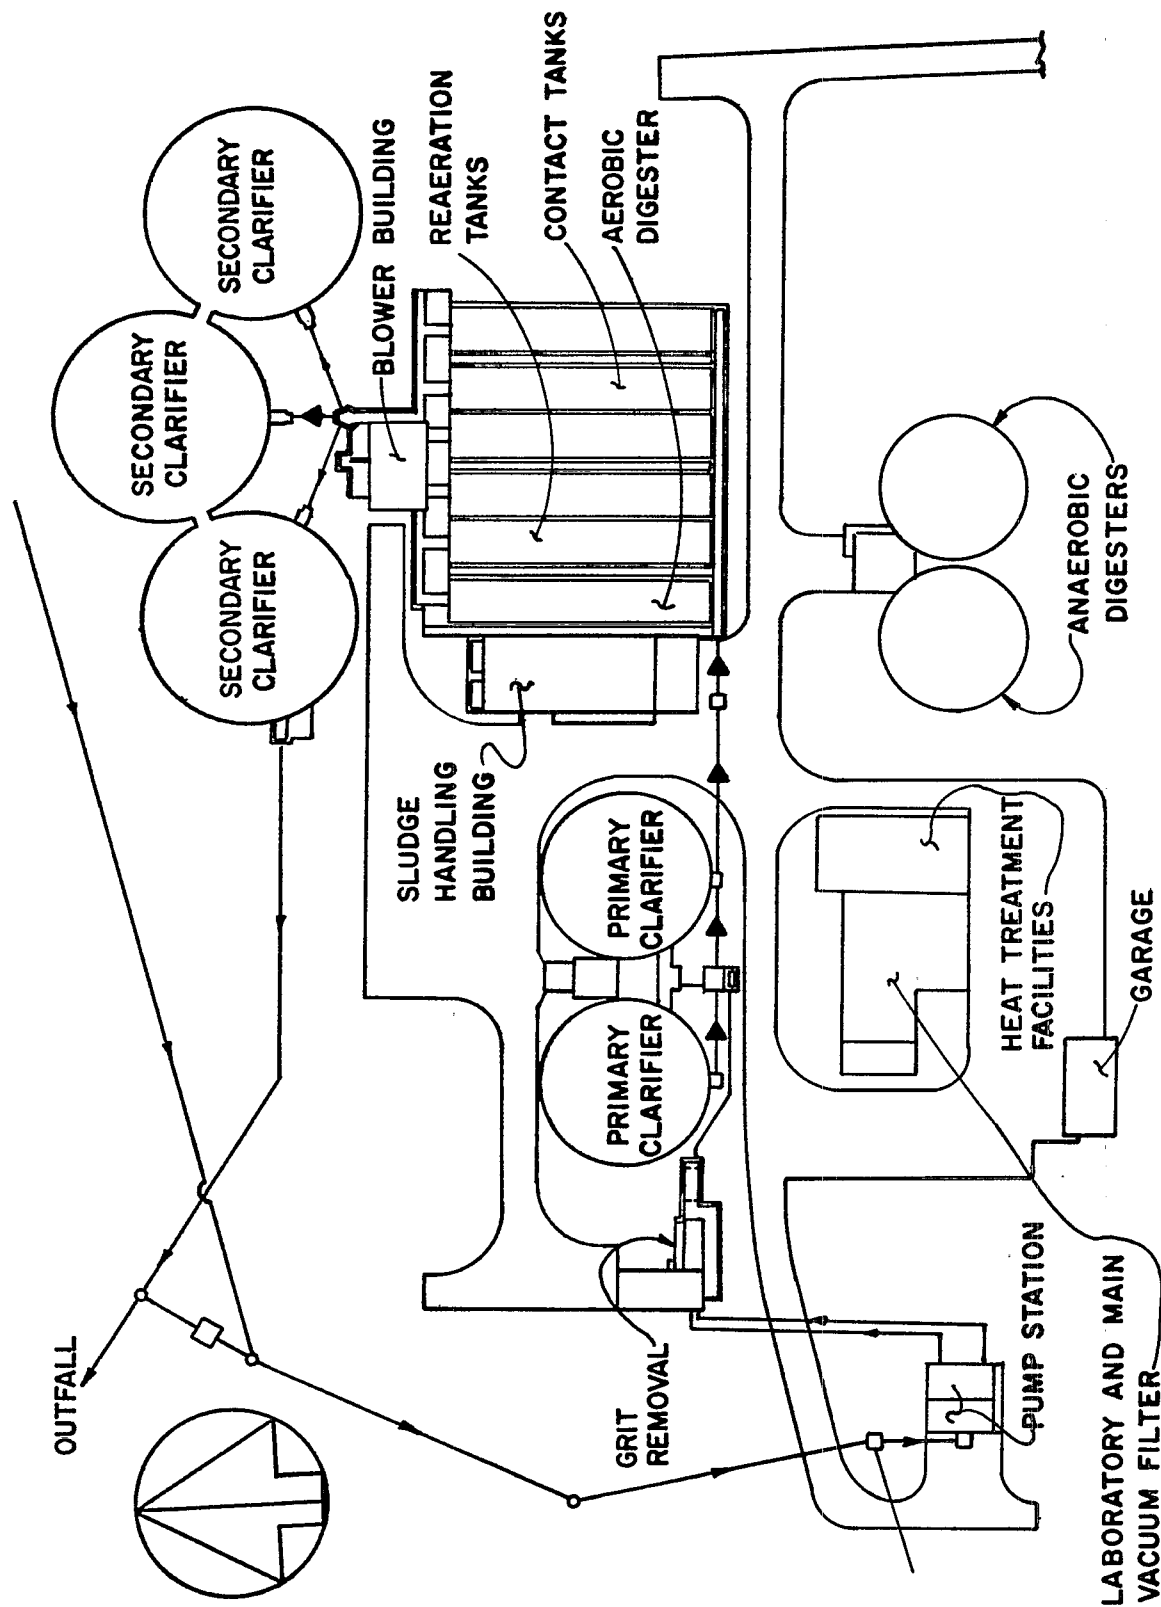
Willoughby-Mentor wastewater treatment plant site plan.
